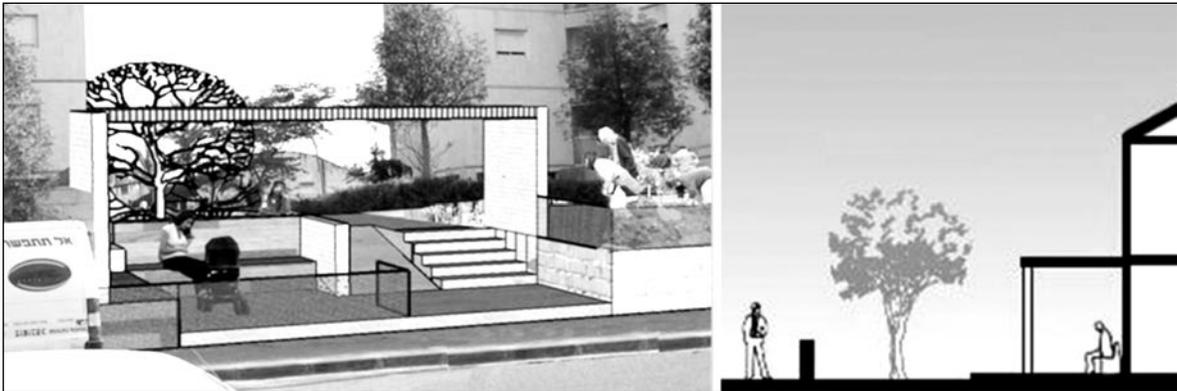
Proposed bench overlooking the street (Student-designer Debora Ribke).
